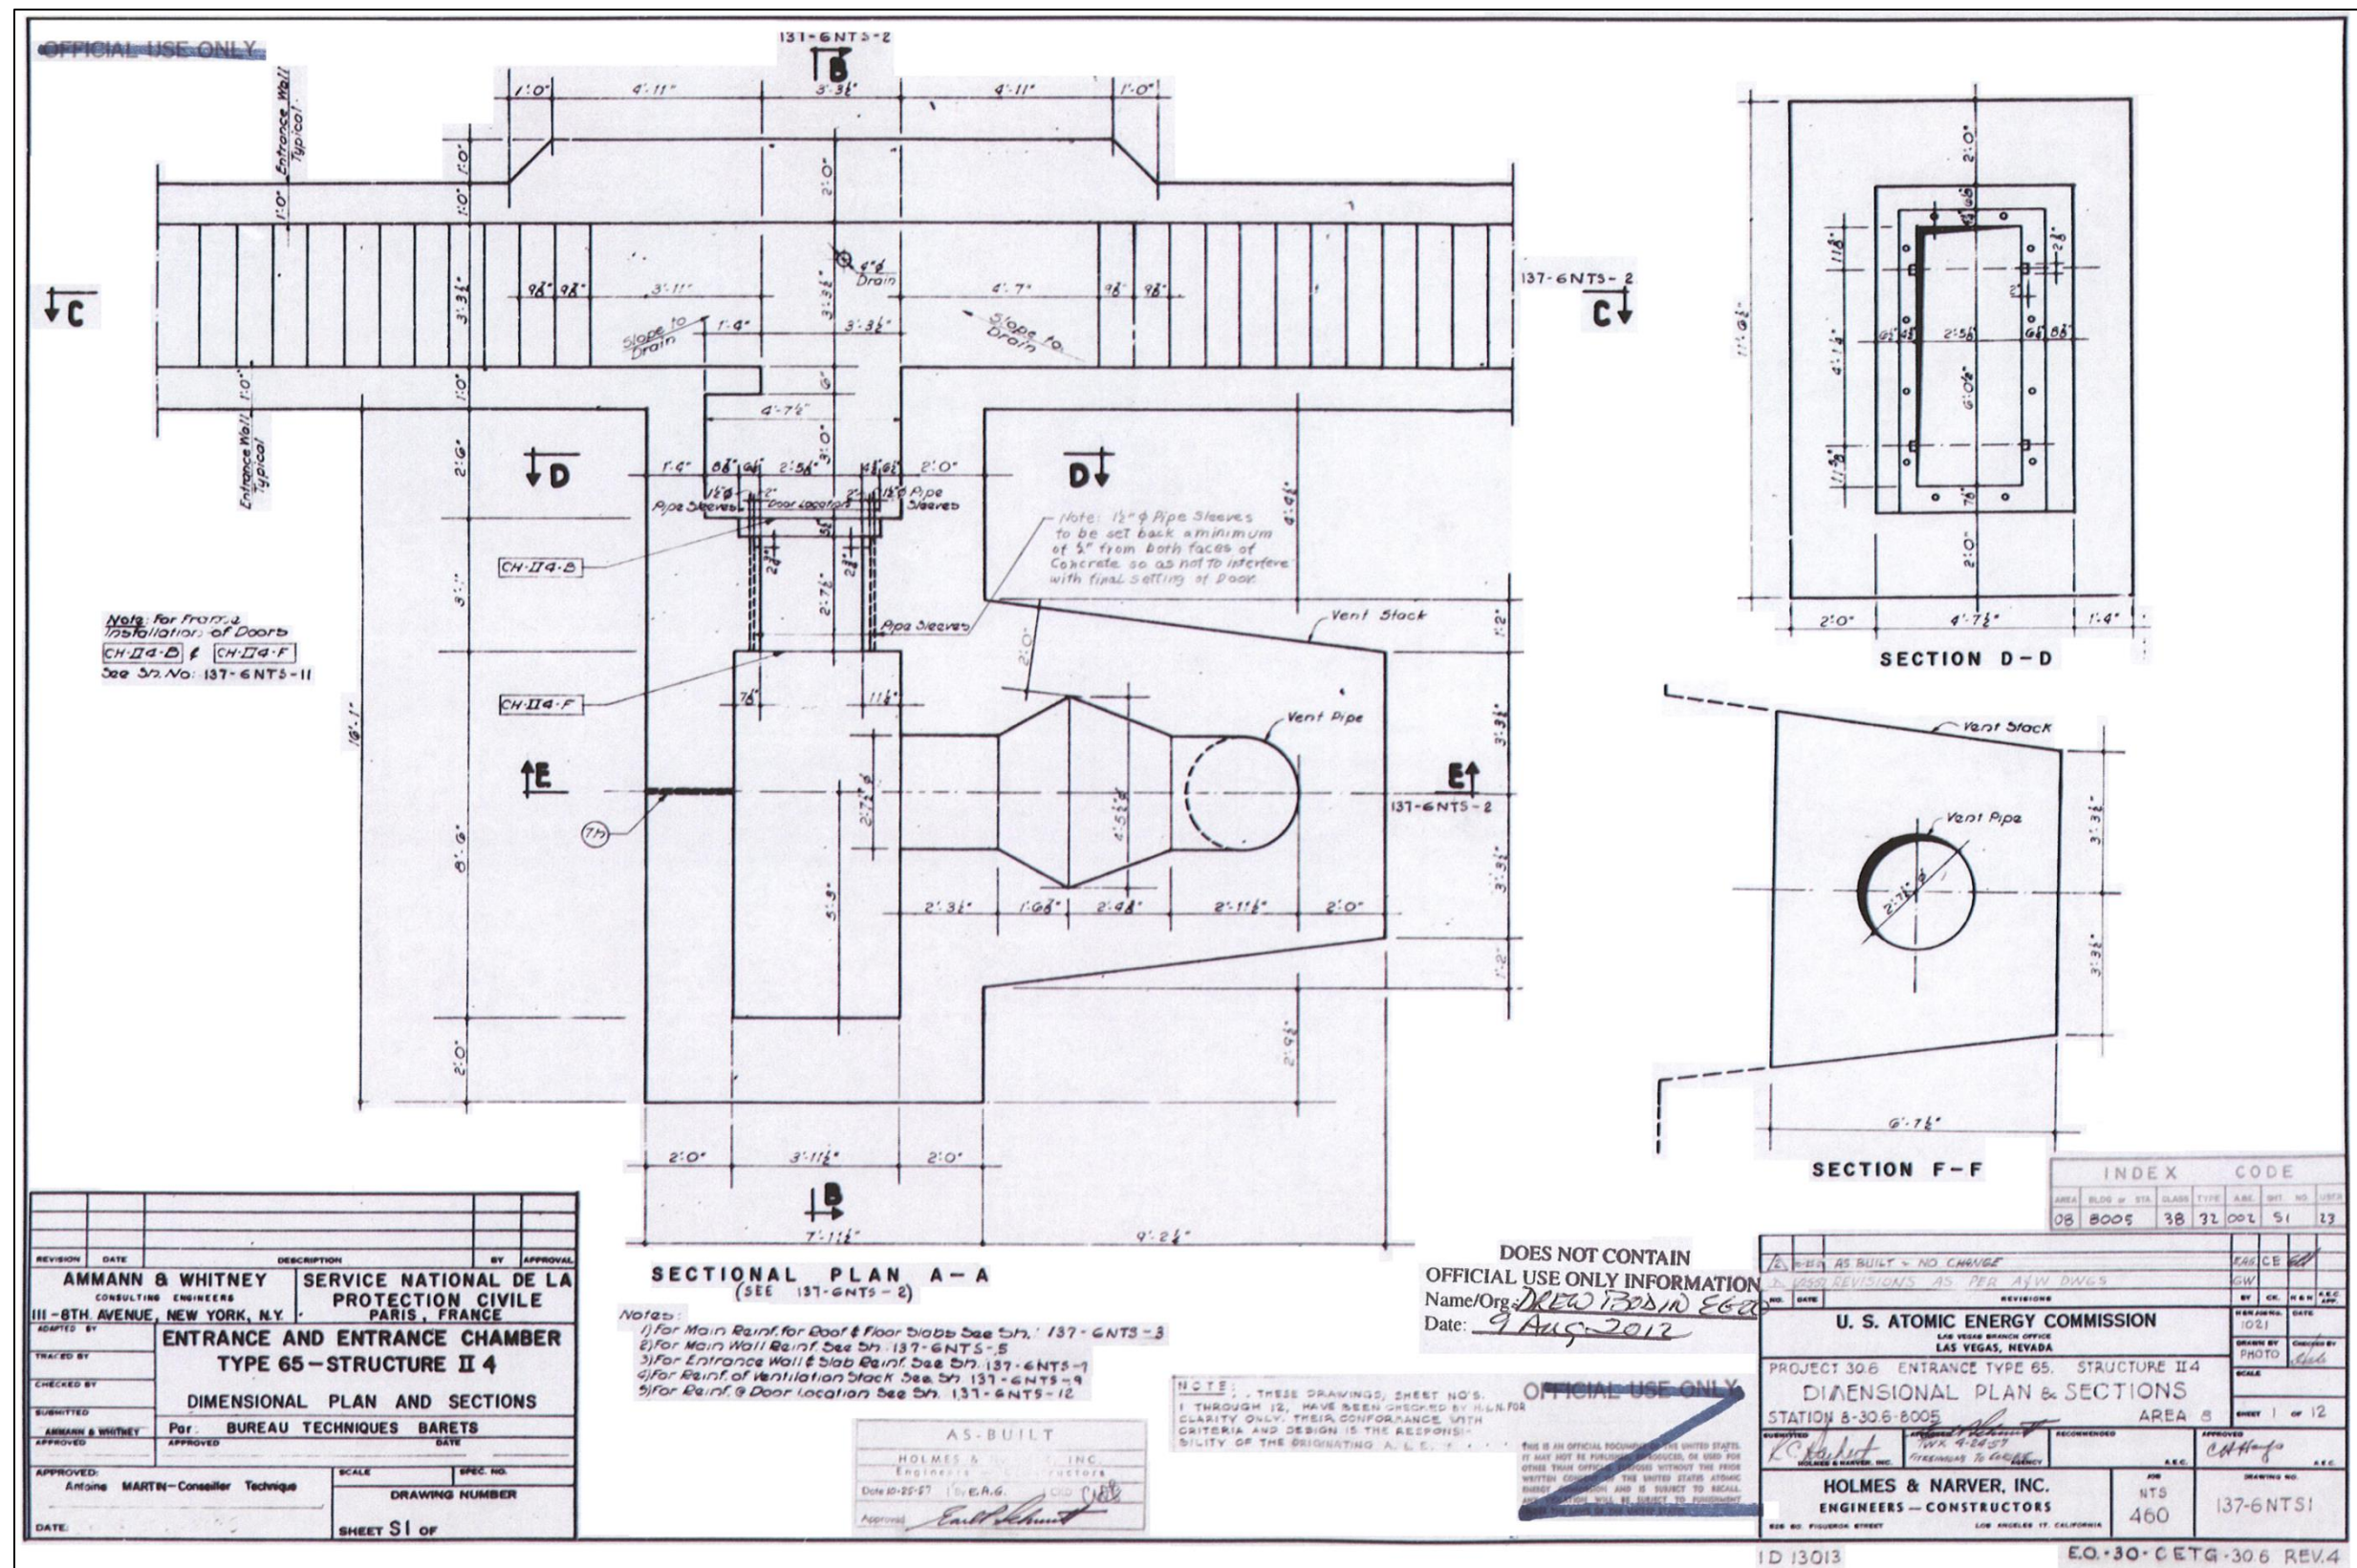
S906, French underground personnel shelter dimensional plan and sections.
